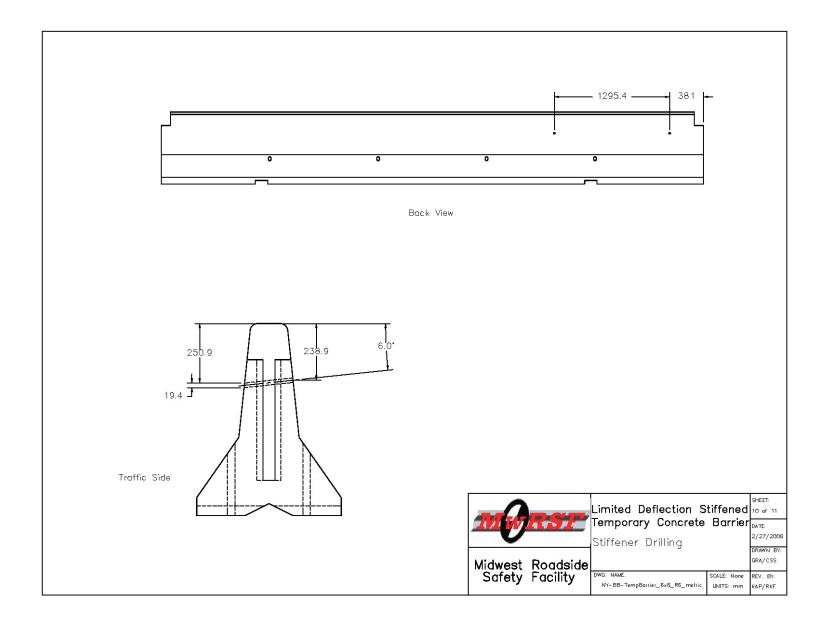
Temporary Concrete Barrier Stiffener Hole Details, Test NYTCB-3
